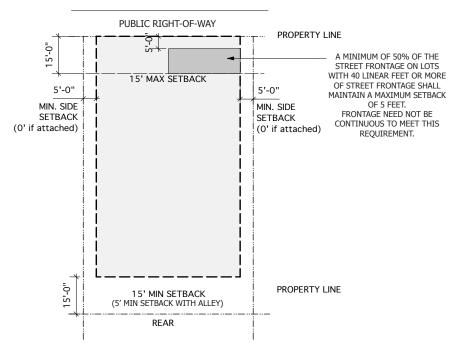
SU-2/VTVC BUILDING PLACEMENT DIAGRAM
